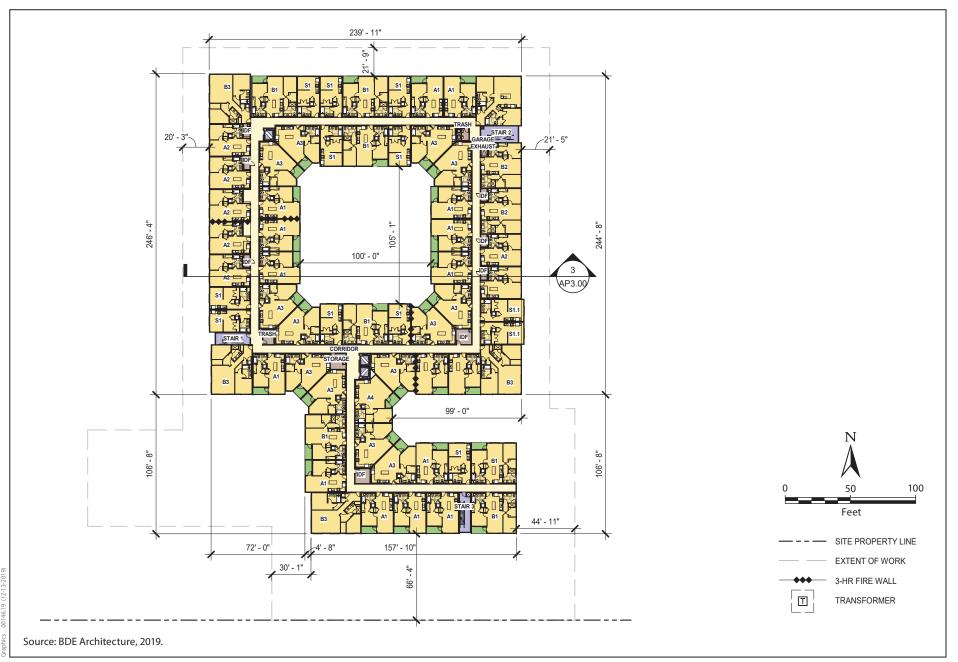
Proposed Level 2 Floor Plan Laguna Clara II Project
